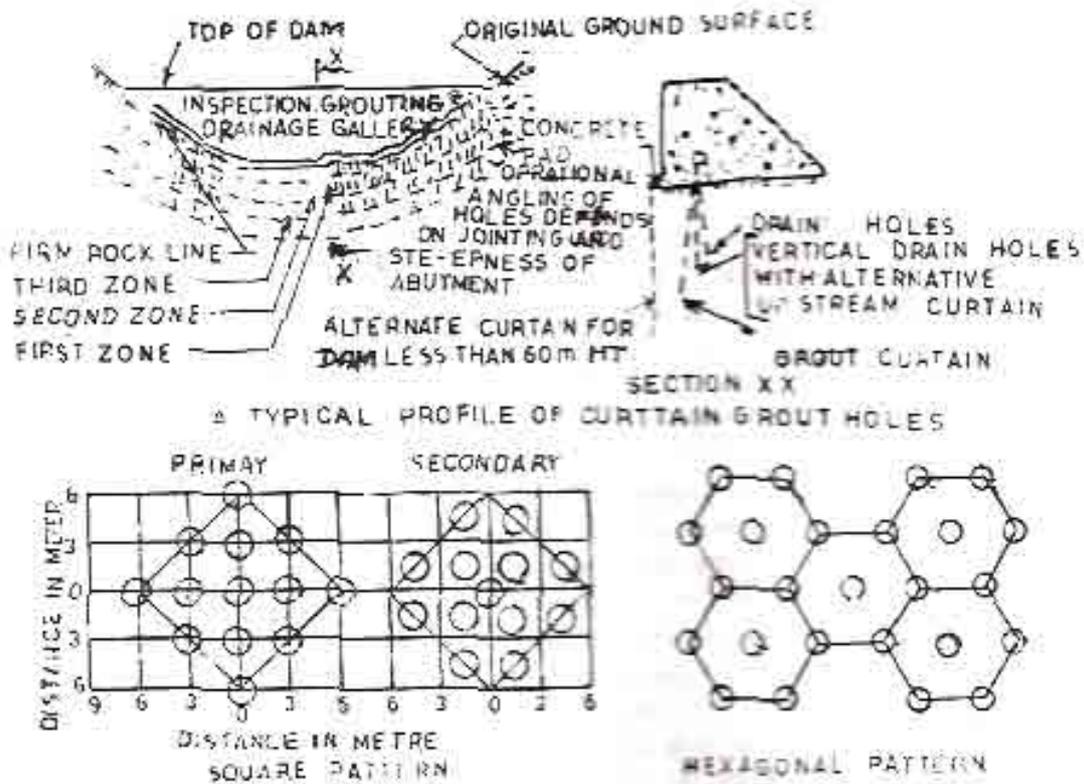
Consolidation Grouting Pattern of Grout Holes.
